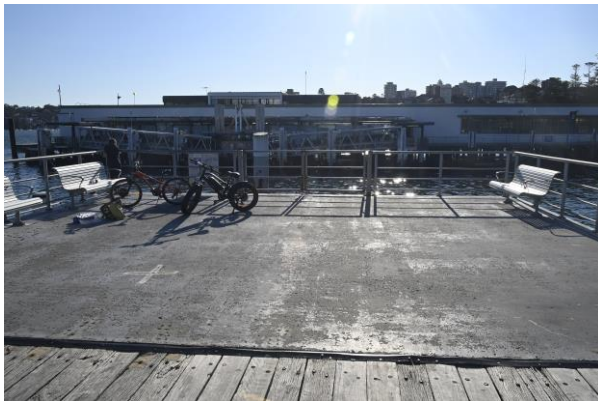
Wharf 3 concrete deck, site of the former Ferris Wheel. Photo looking west (Artefact, 2021)
